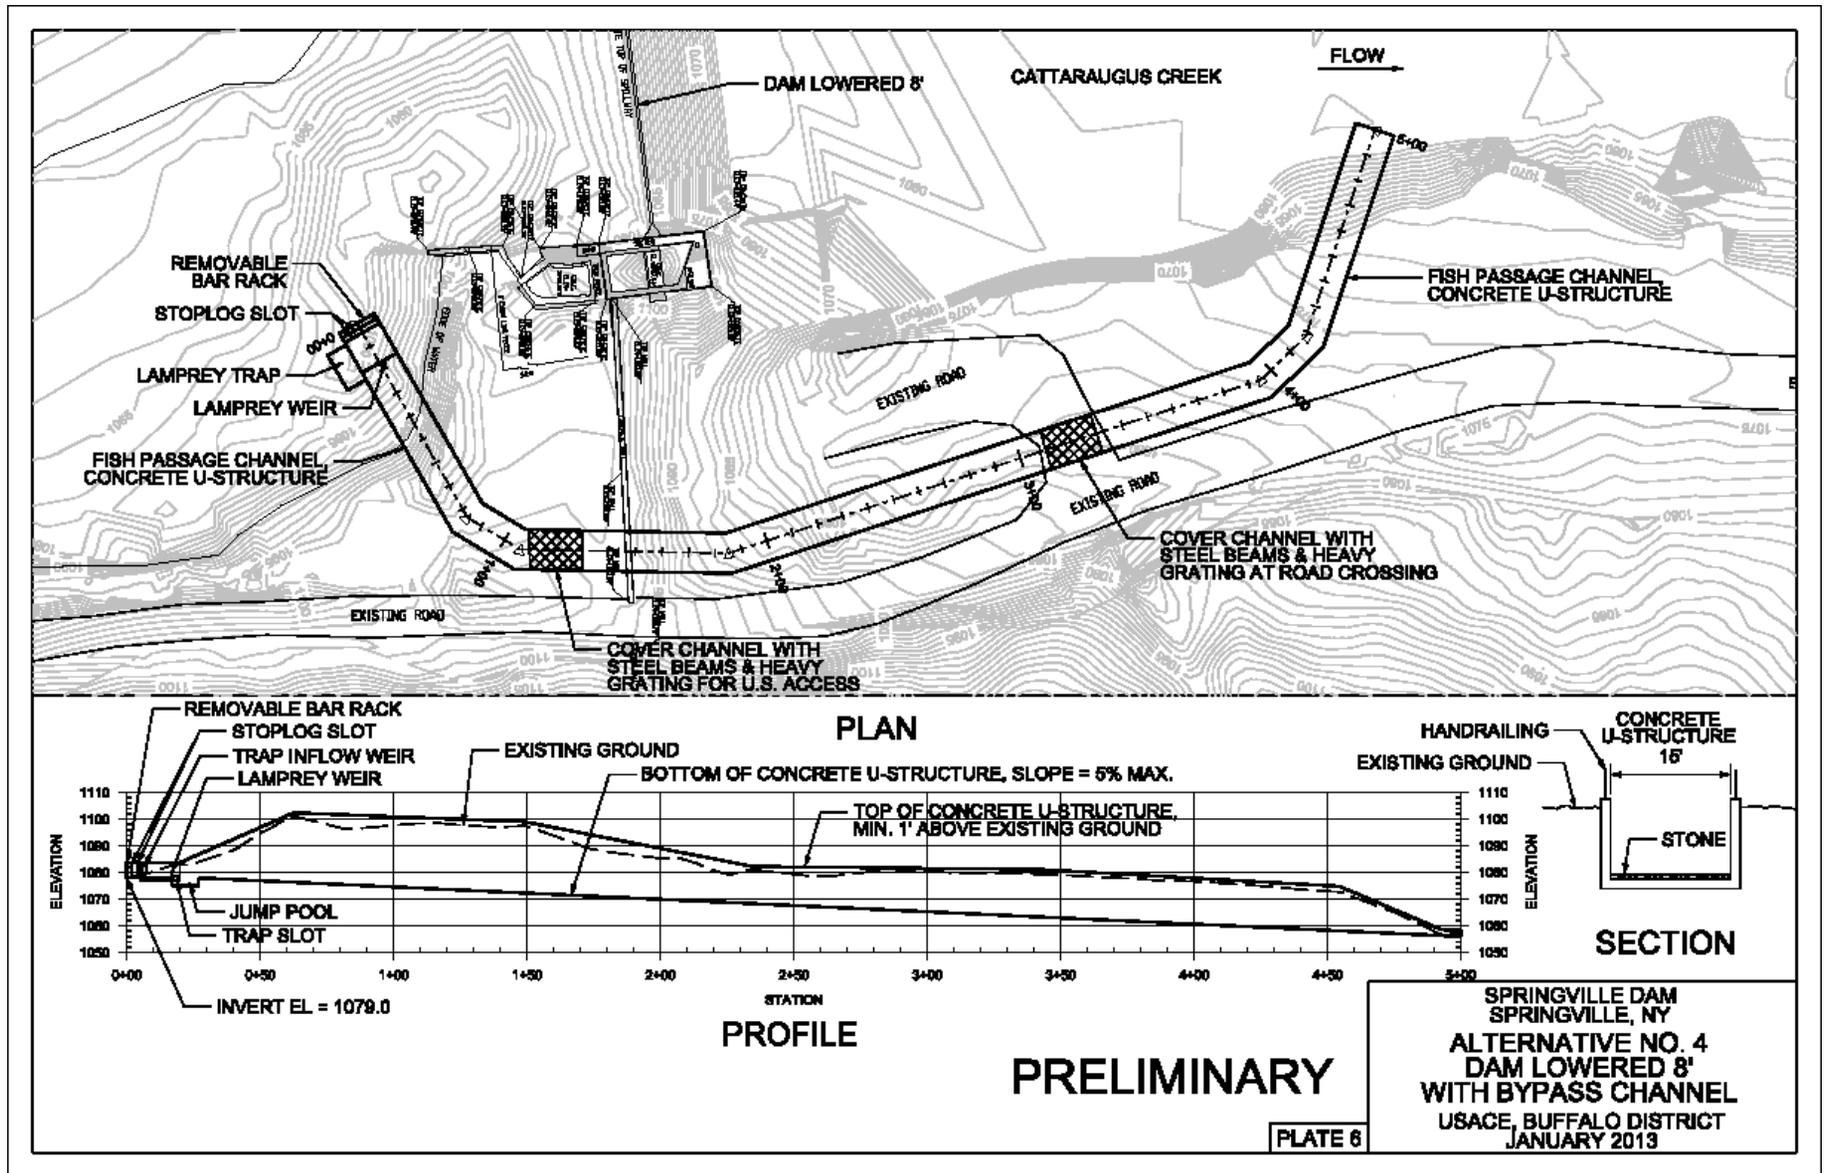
Plan and profile drawings for Alternative #4 – Dam lowered eight feet with bypass channel.
